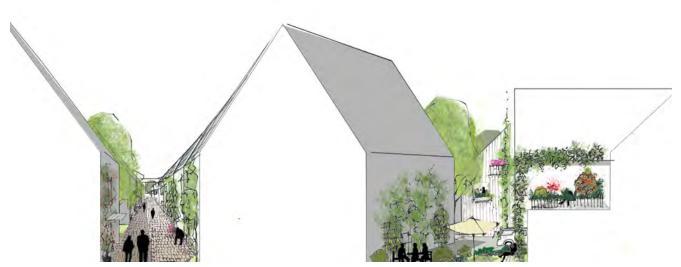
Cross-section views of a laneway with green façades and greened rear courtyard with rooftop (own illustration)
